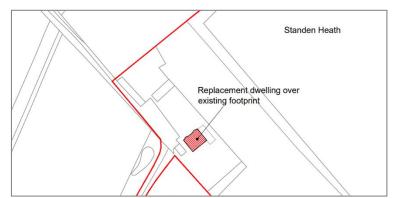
Approved site plan showing the replacement dwelling under reference 20/01595/FUL.
